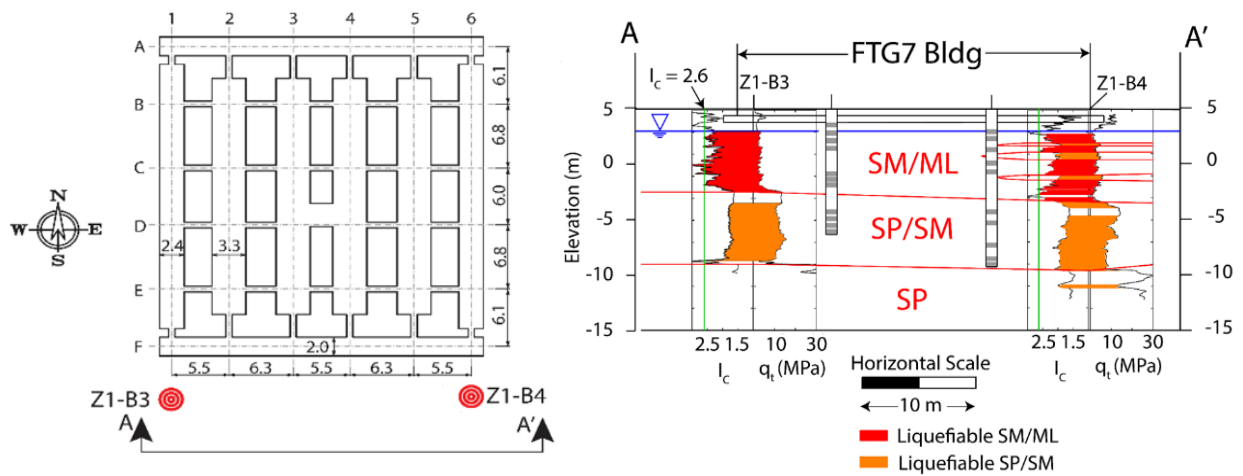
Plan view (top) and Section A-A' (bottom) of the FTG-7 building (Zupan 2014).
